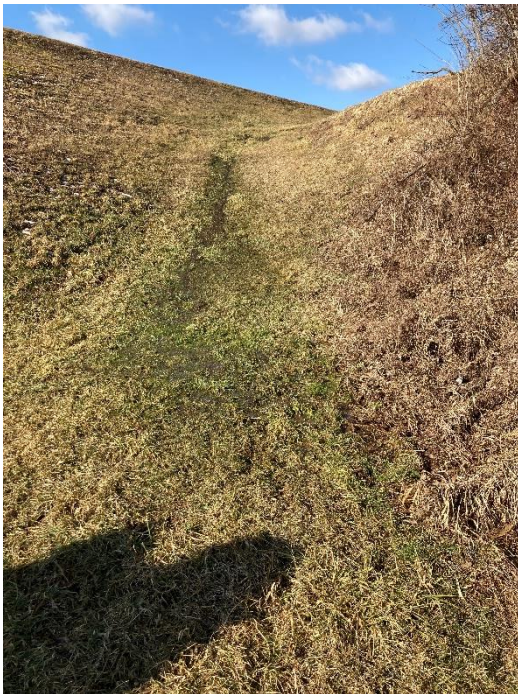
Ringtown Dam No 6 – Downstream Embankment Right Side- With Seep
